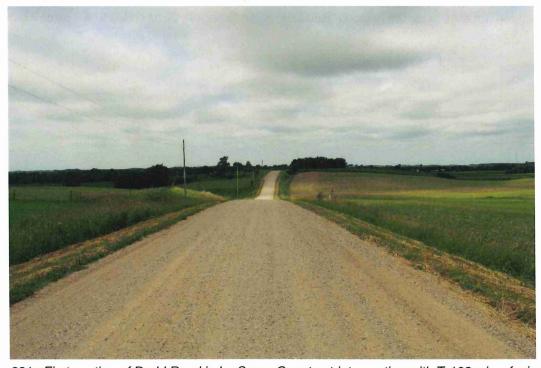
First section of Dodd Road in Le Sueur County at intersection with T-108, view facing west.
